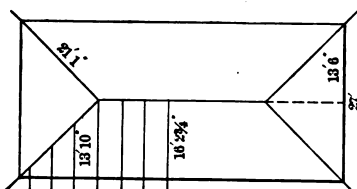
Roof Plan Showing Common, Hip and Jack Rafters.
